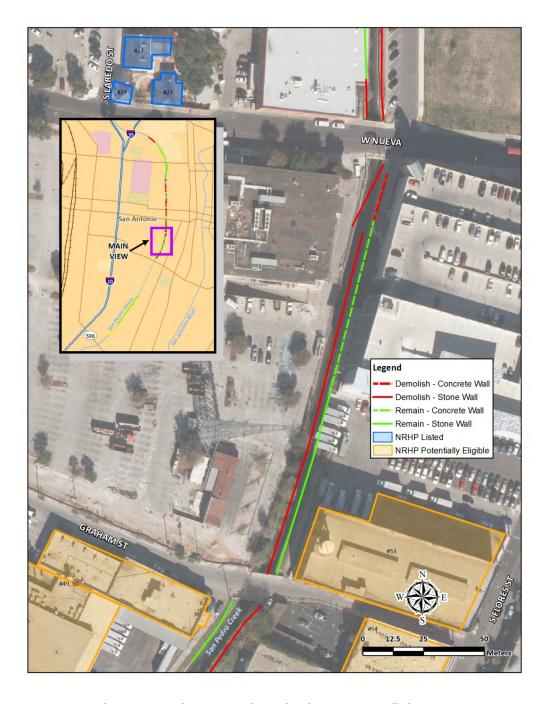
Proposed impacts to the west and east bank retaining walls between West Nueva Street and Graham Street.
